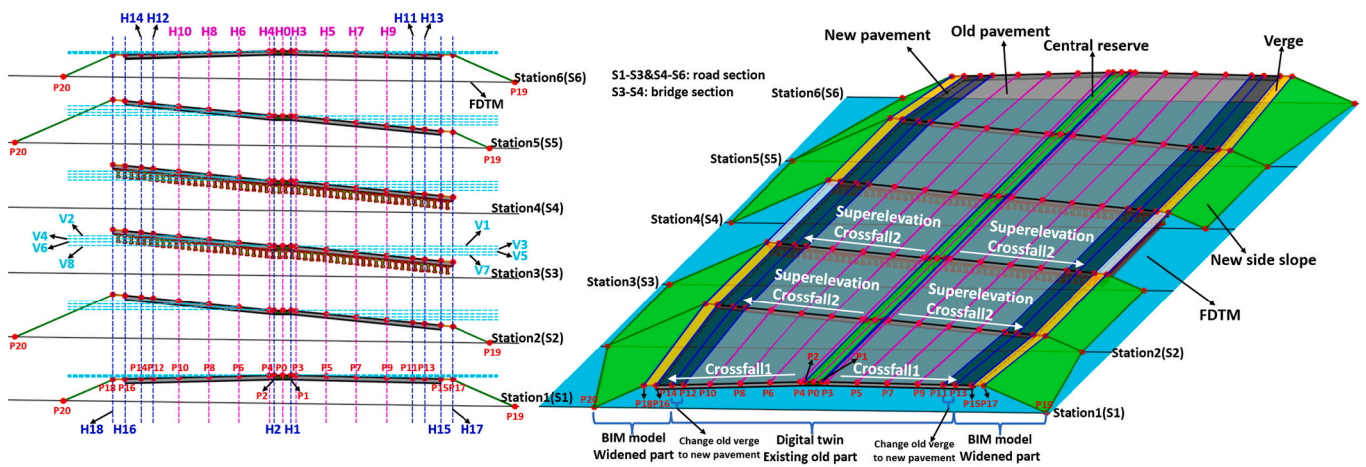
BIM model of the newly widened road based on the digital twin of the existing main road.
